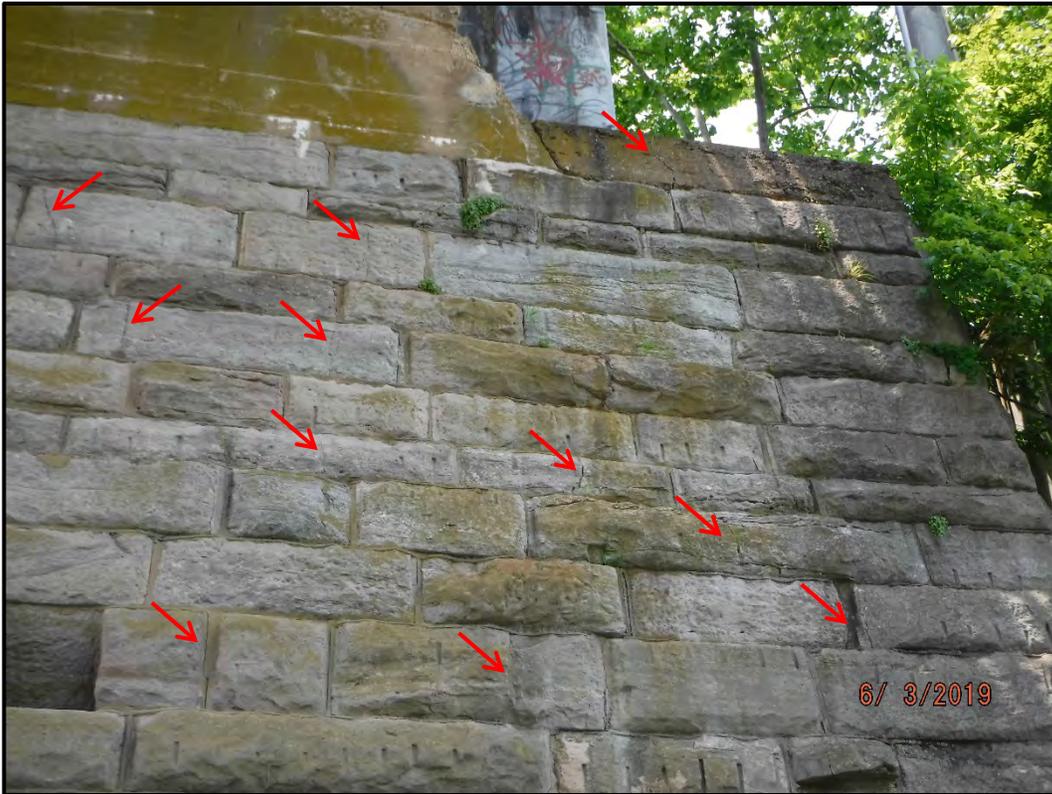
Minor cracking throughout the north end of the Pier 6 east face.
